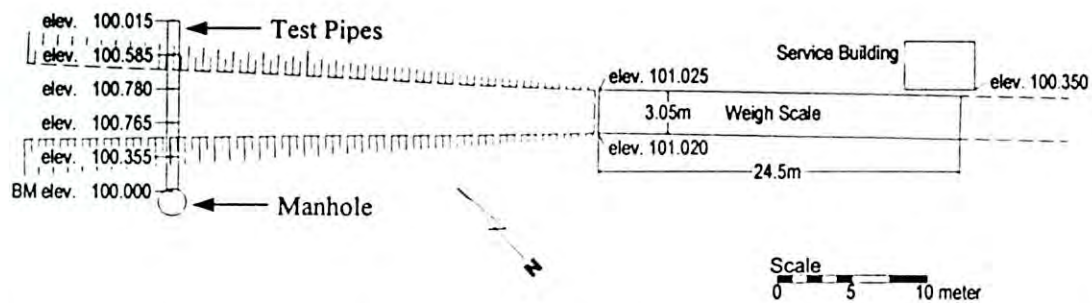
Plan View of the Pipe Bed at the Barrie Test Site (Wong, 2002)
